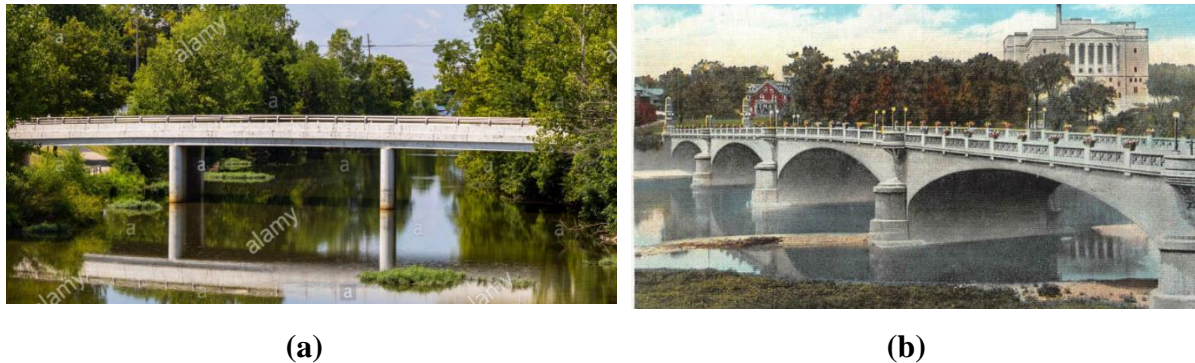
(a) Pierce Street Bridge in Lima, Ohio and (b) Dayton, Ohio's Salem Avenue Bridge (Salakawy et al. 2003).
